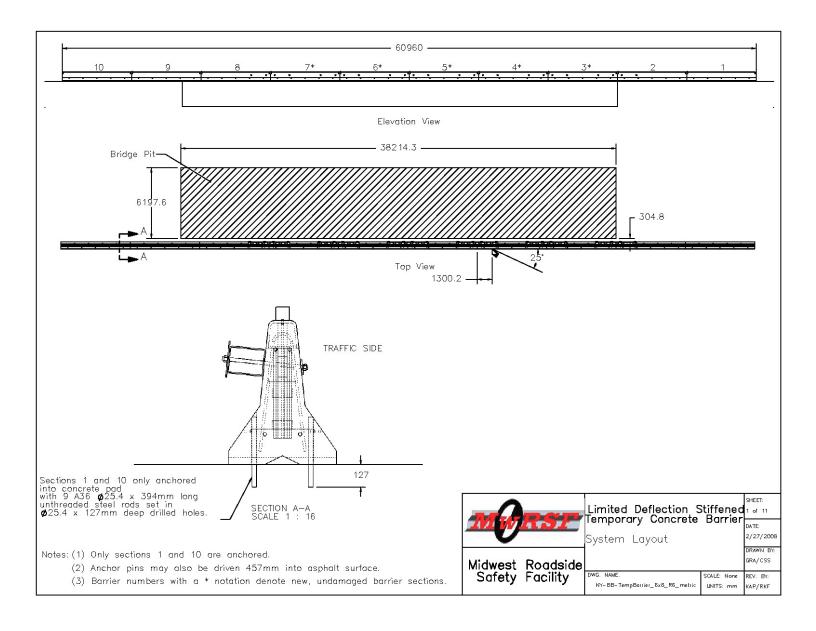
Stiffened Temporary Concrete Barrier System Layout, Test NYTCB-3
